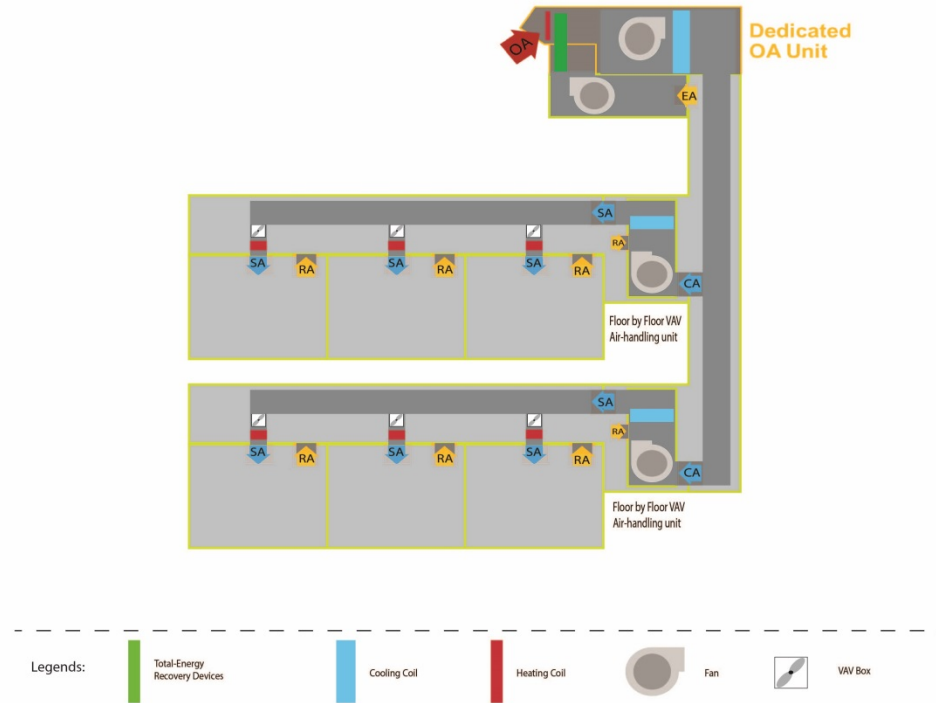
DOAS used with floor-by-floor VAV air-handling units (Modified from Murphy, 2010).
